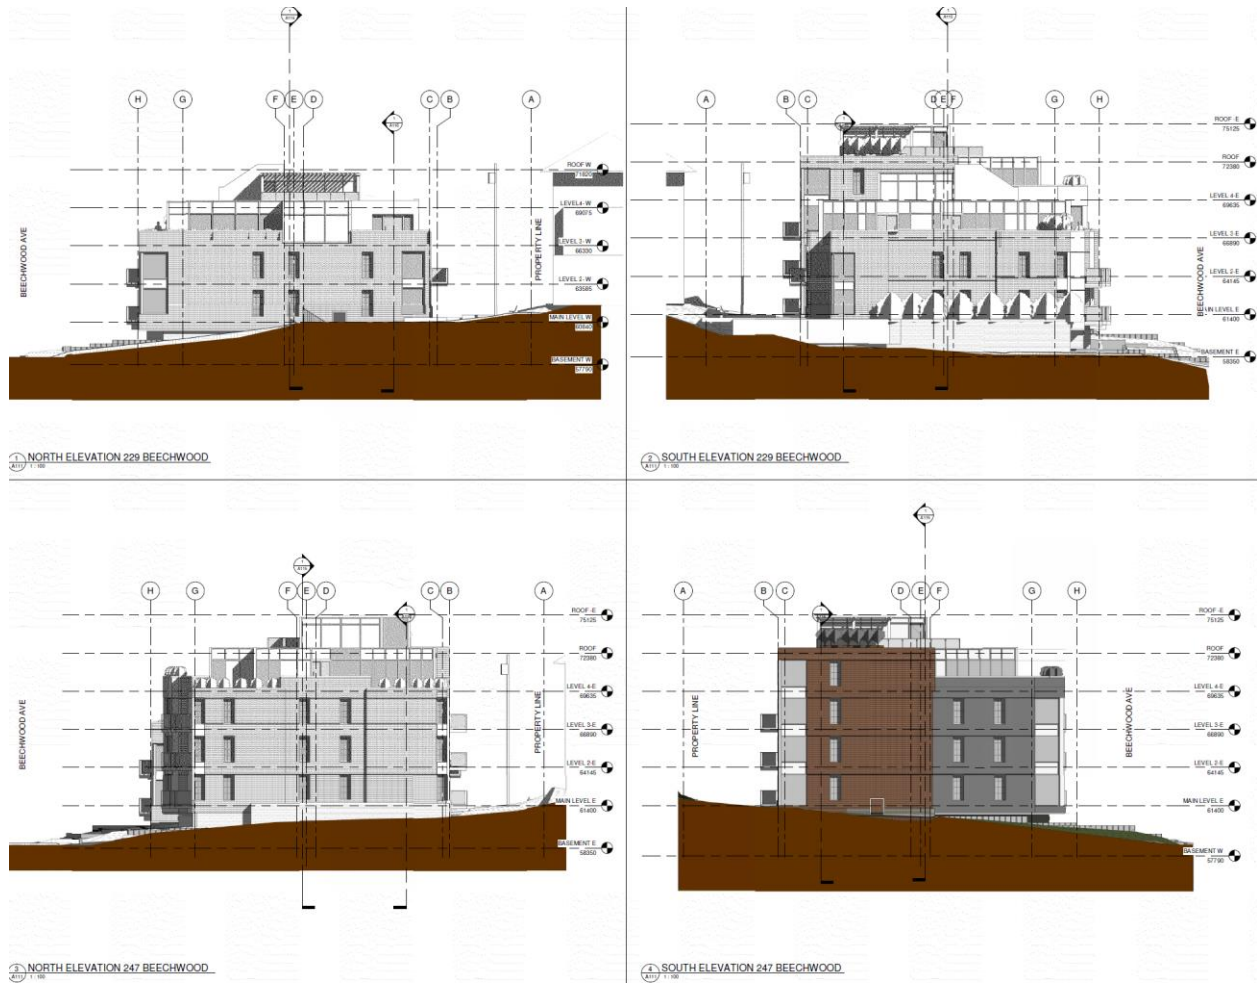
North and South Elevations are well detailed providing well-finished elevations towards neighbouring properties. Source: Woodman Architect 2022.
